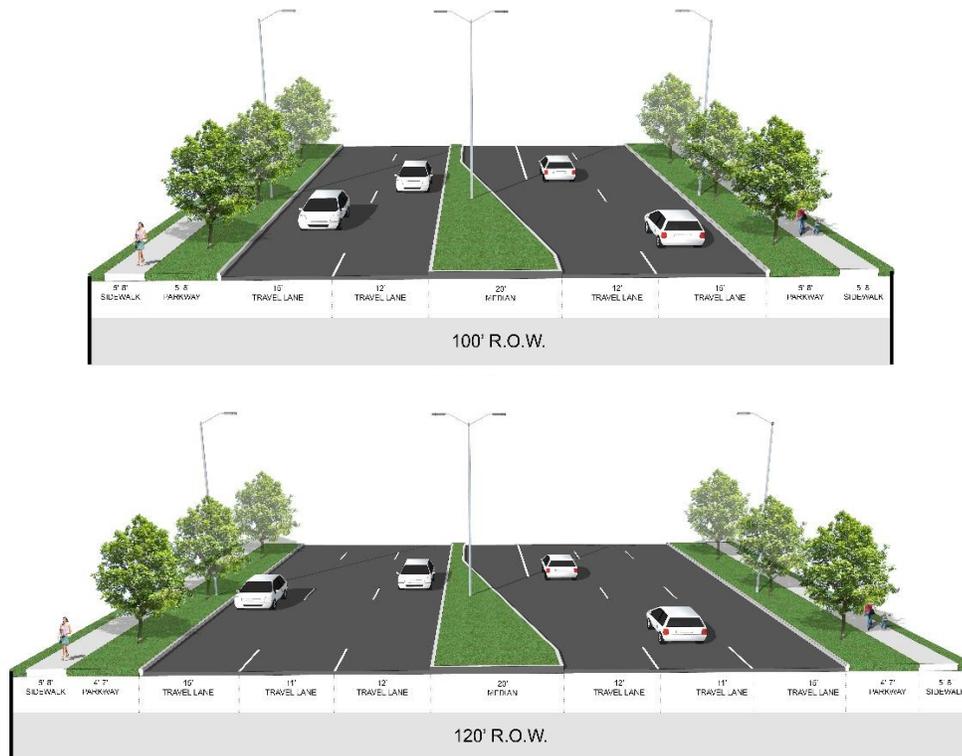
Typical Section of Rural Principal Arterial Roadways
